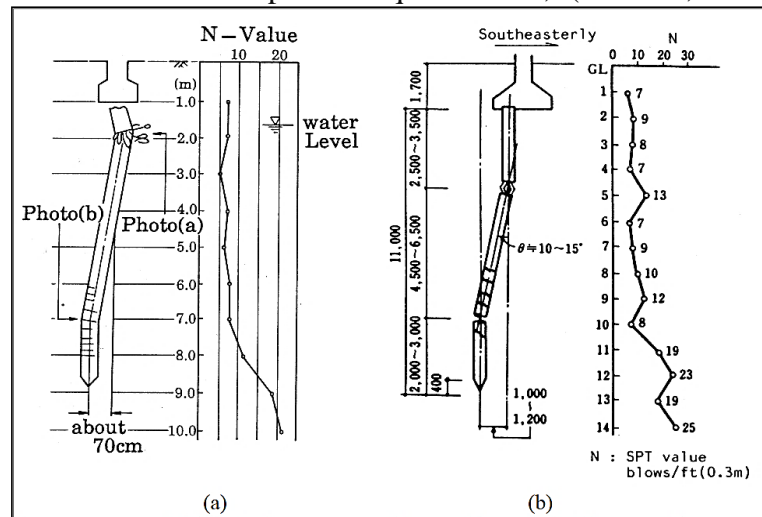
Correlation of Pile Damage to Site Conditions at (a) Niigata Family Courthouse and (b) NHK Building, (Dobry, 1995)
